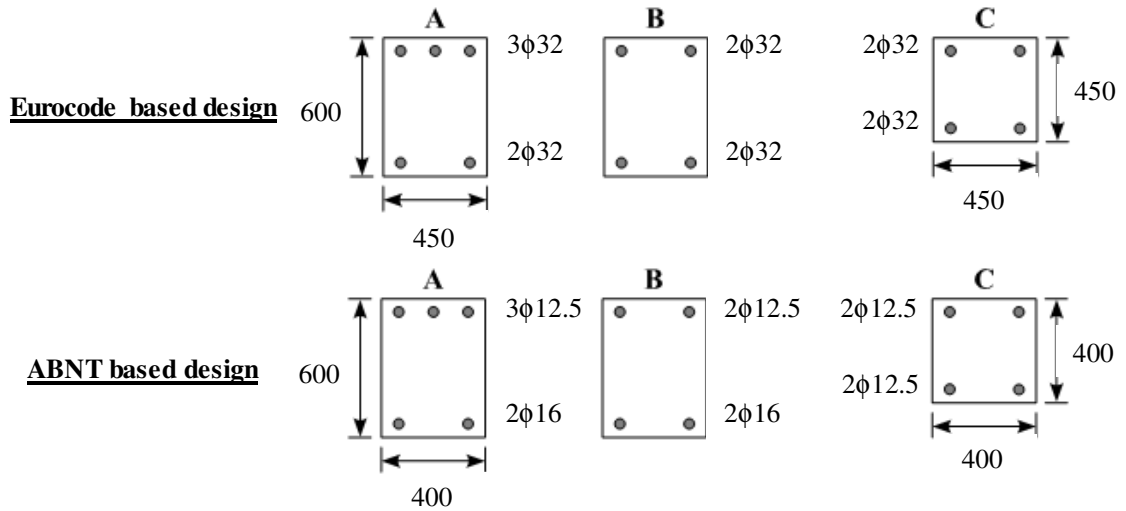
Reinforcement schemes (A, B and C correspond to the sections defined on Fig. 2).
